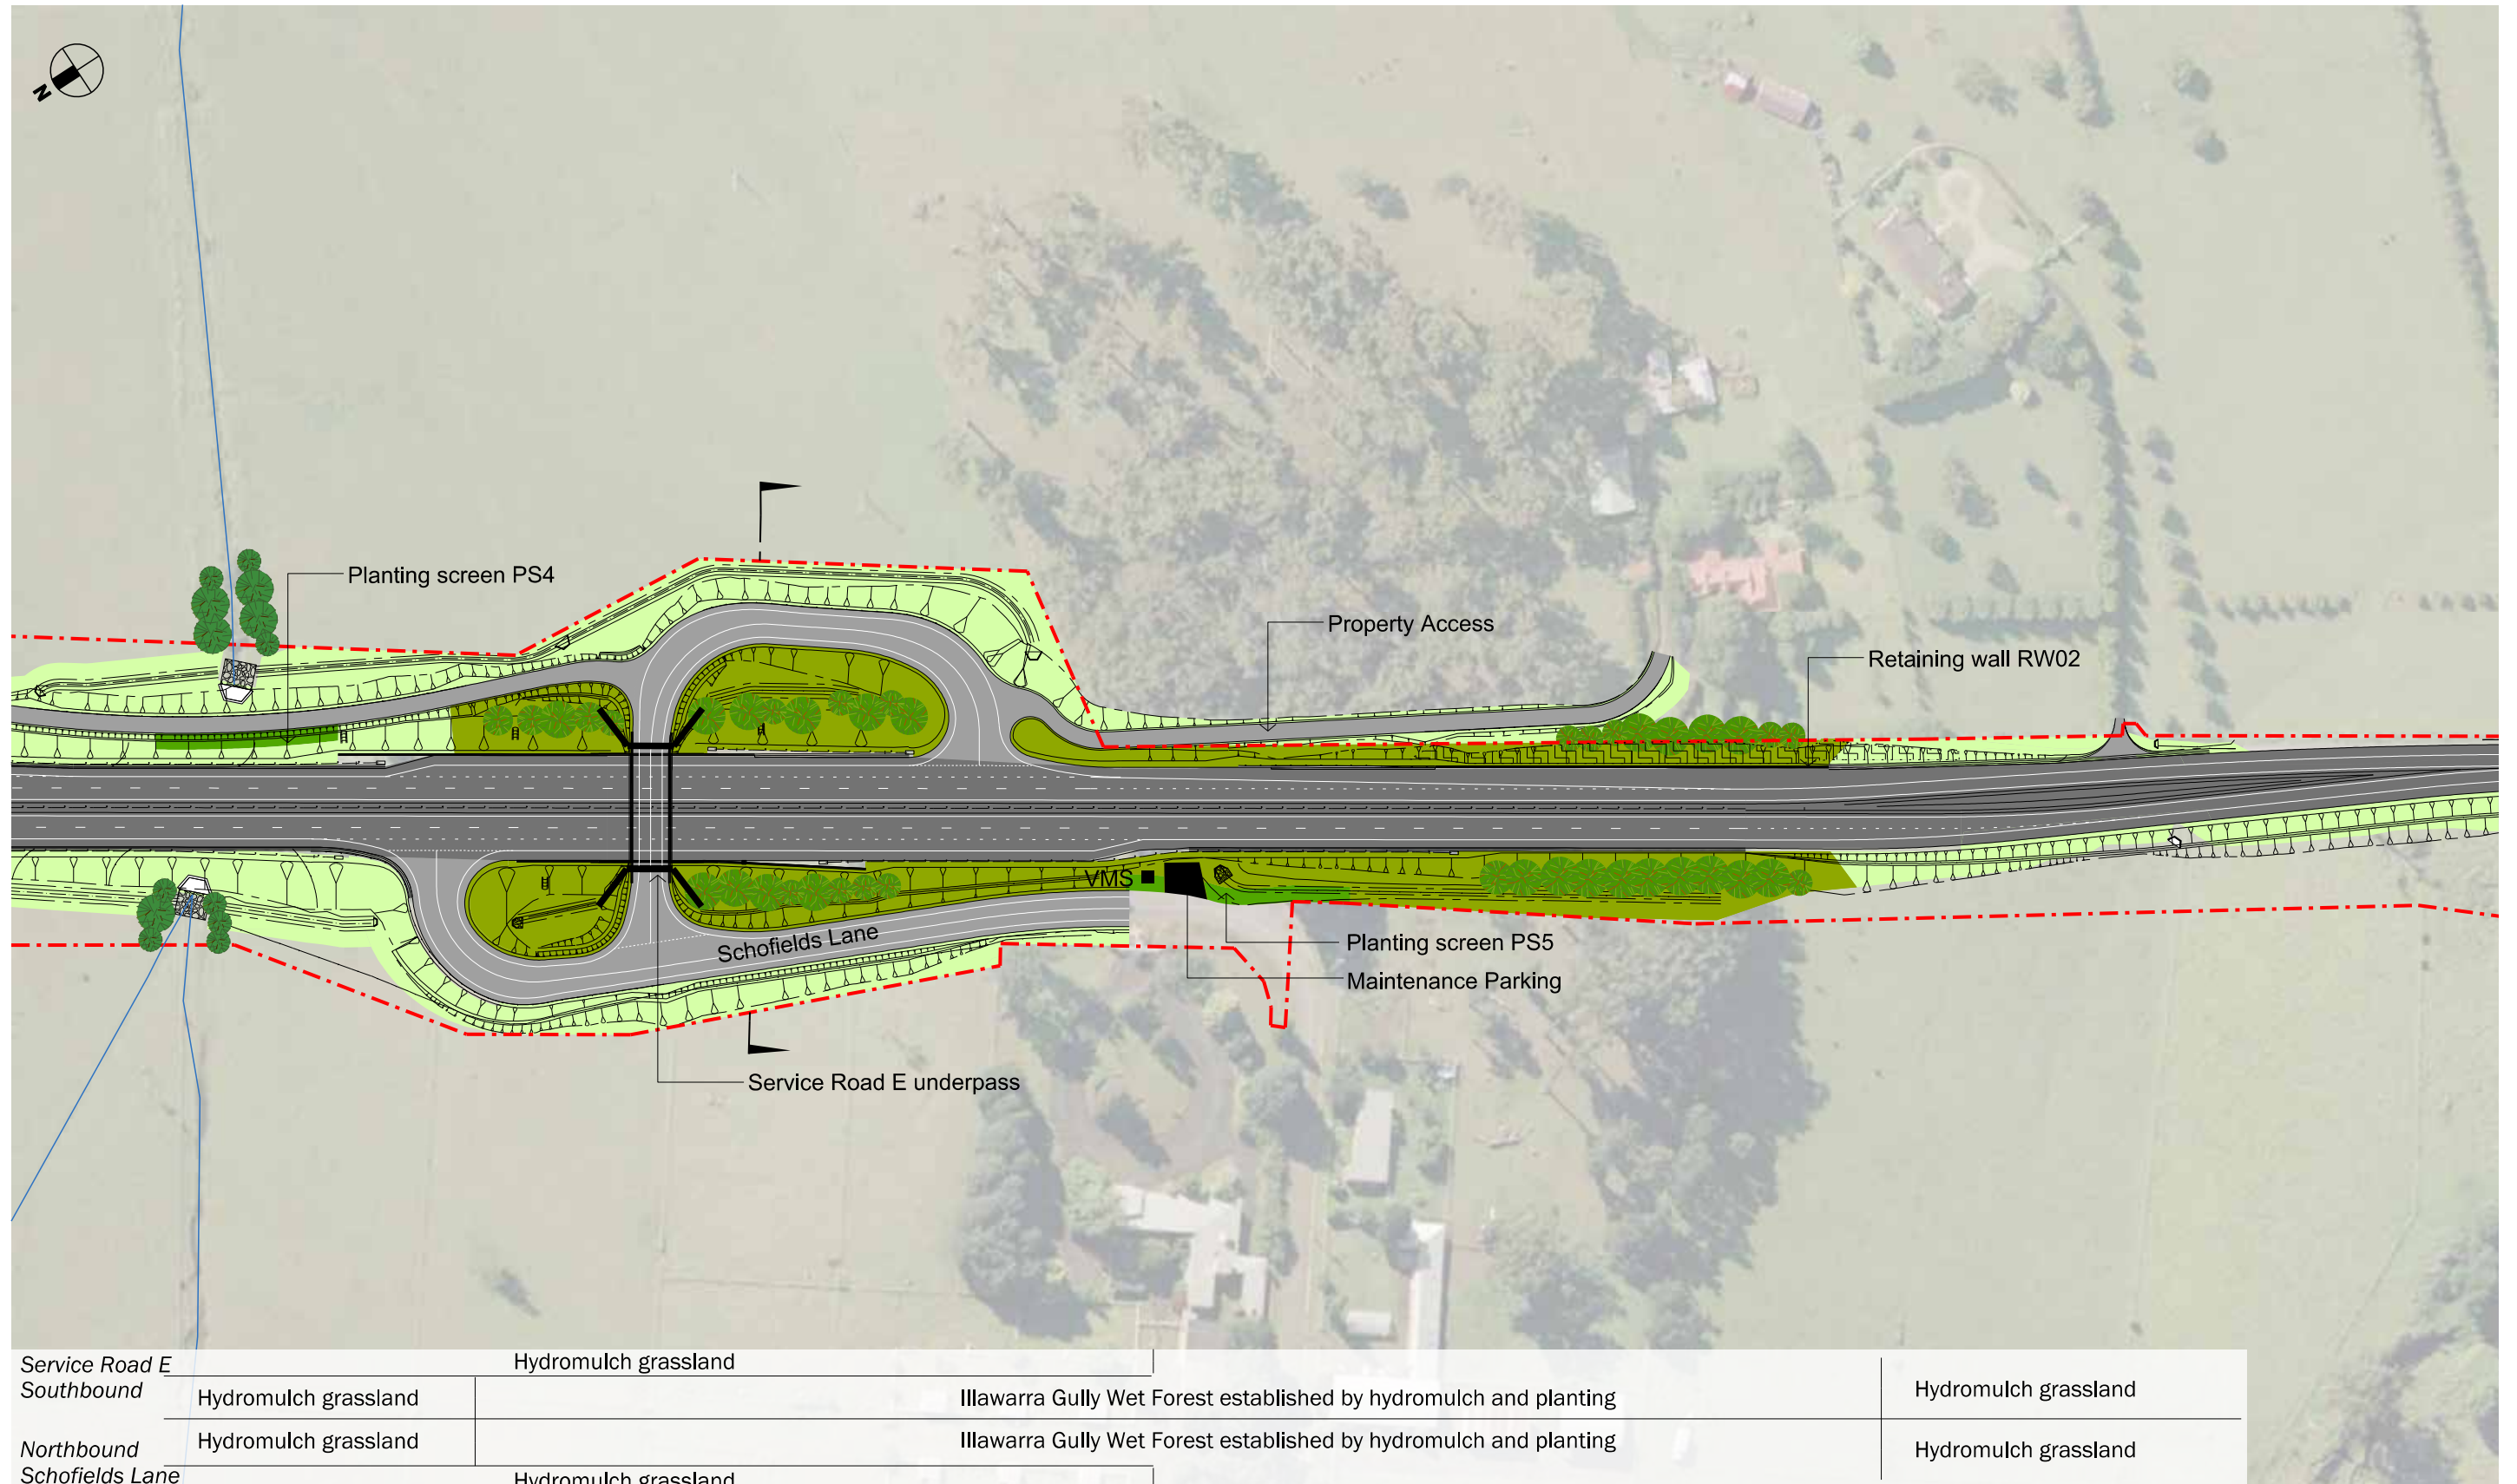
Urban and landscape design plan (Sheet 20) - Berry Character Zone
